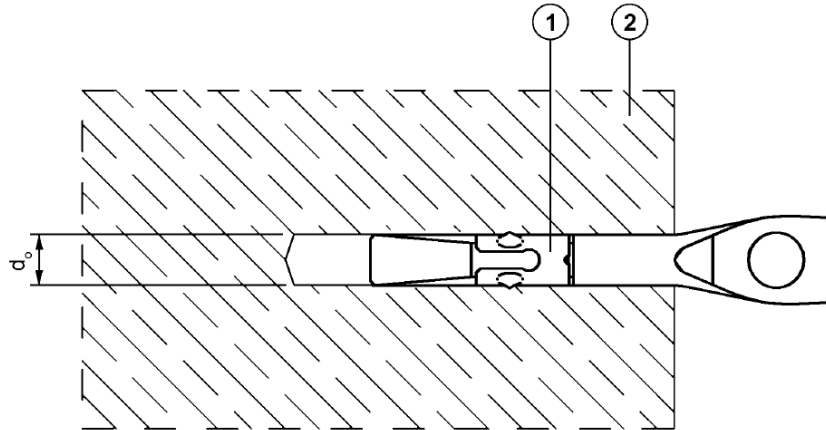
Fastening made with use of a TT-THROUGH BOLT steel expansion fastener of TWH version
